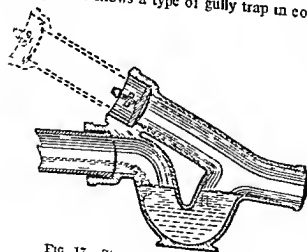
Stoneware Disconnecting Trap with clearing arm extension
